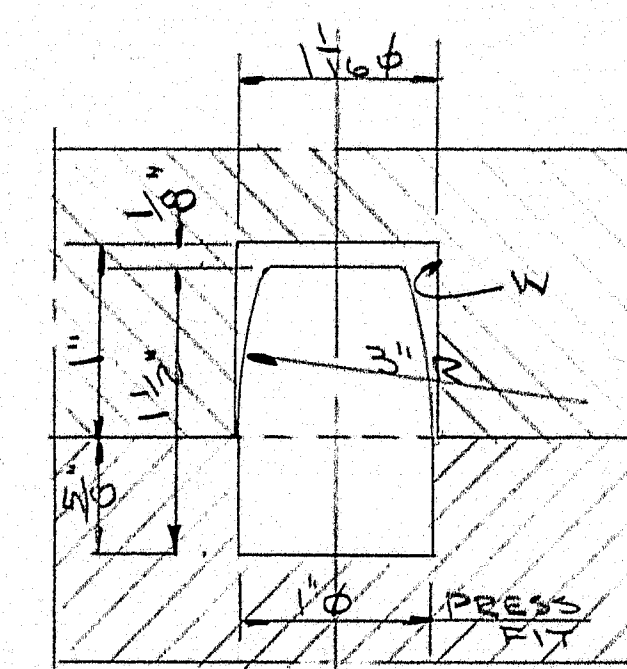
PLATES TO BE STRAIGHT & TRUE AFTER WELDING. SURFACES MARKED 'W' TO BE PAINTED WITH WHITE LEAD & TALLOW. SCALE WEIGH SHOP ASSEMBLIES. MAKE METAL TEMPLATE FOR DRILLING 1/16" HOLES & SHOP TO USE SAME FOR GIRDER HOLES. SEE DWG 52 FOR FINED BRGS & ANCHOR BOLTS.
